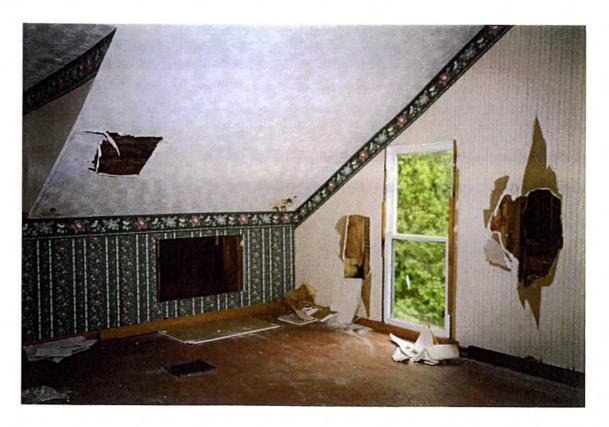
Chamberlain House east bedroom (Room 202), view looking northeast, May 2001.
